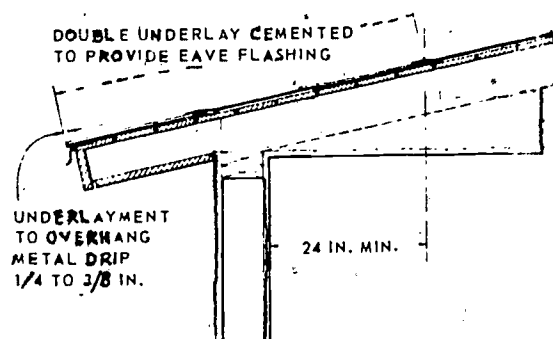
Underlay plies cemented together to form eaves flashing for low-sloped roofs.
